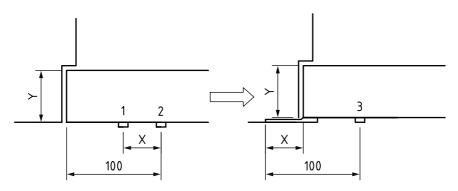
b) — Ventilation grilles (louvres) in door leaf tested with ventilation grille (Larger size)
